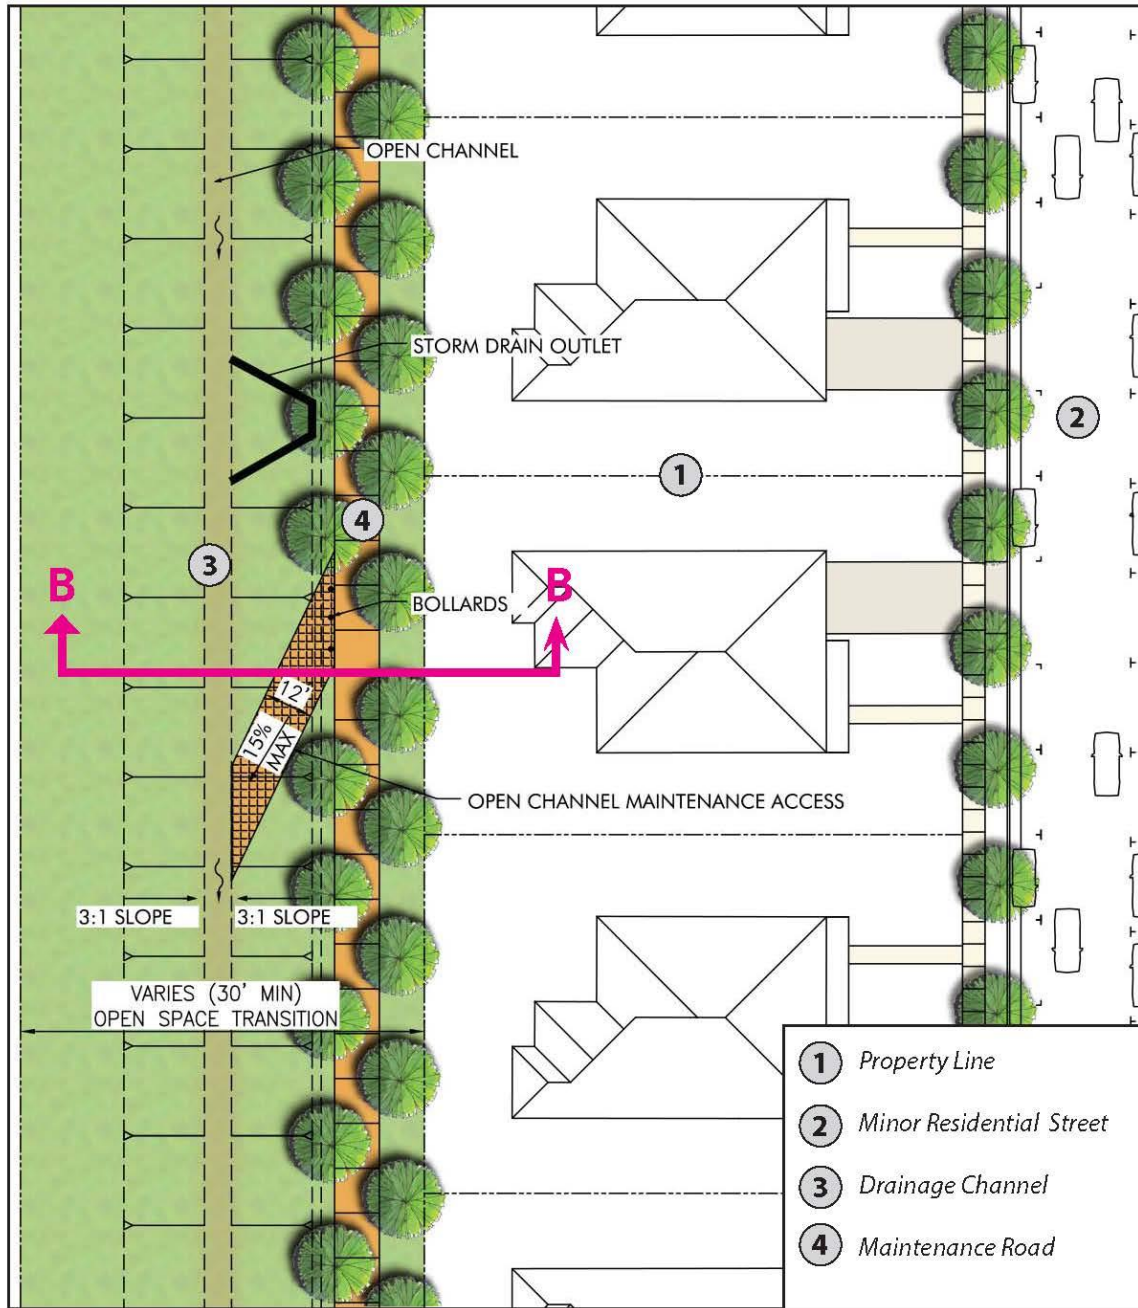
Typical Open Space Transition Along Open Space Drainage Channel – Homes Backing Condition
